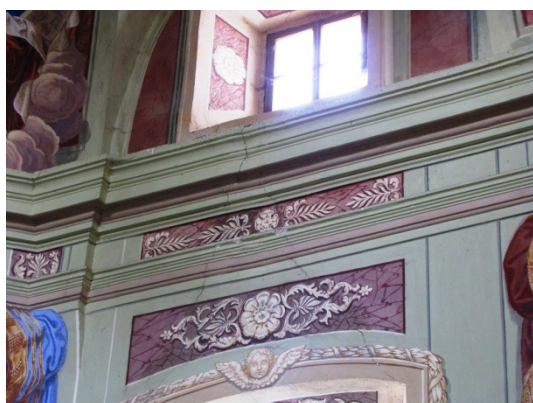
Photographs of some typical damages to churches: detachment of plaster or nonstructural elements
